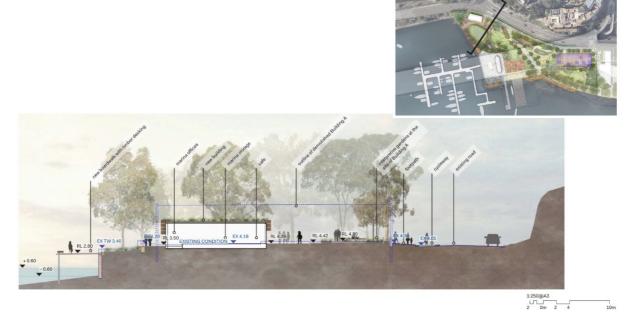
Section F (approximate north–south section) through northwest end of Bank Street Park, showing the proposed raising of ground level at 1–3 Bank Street (following demolition of Buildings B and C and partial demolition of Building A). (Source: Client provided)
